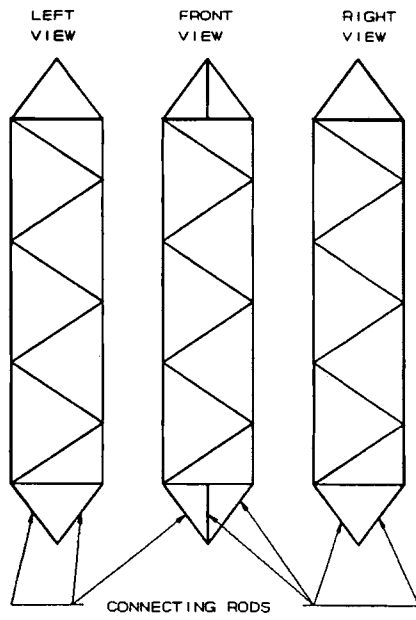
Sketch of Vertical Profile Looking Toward the Runway.
